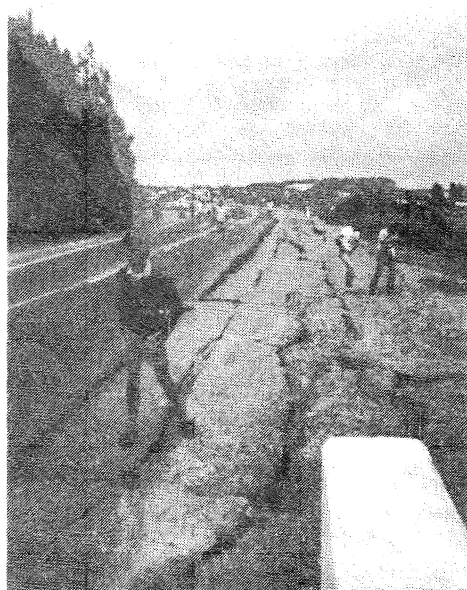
Cracks in the approaches to the Landing Rd. bridge over the Whakatane River.
